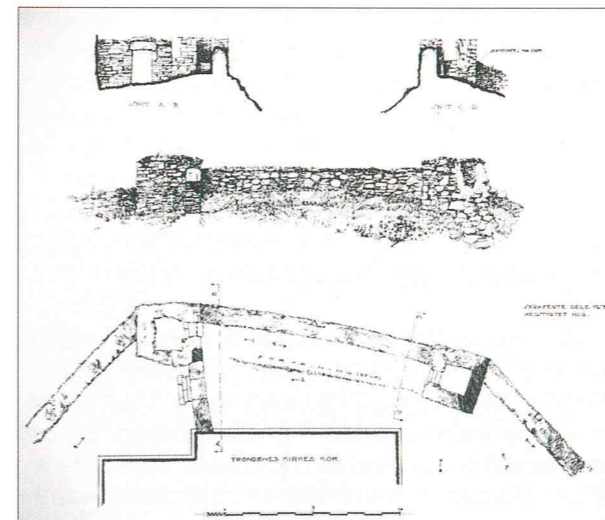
Trondenes church. Plan of the remains of the curtain wall, made by Harald Sund 1927. Original in Riksantikvaren's Archive, Oslo
